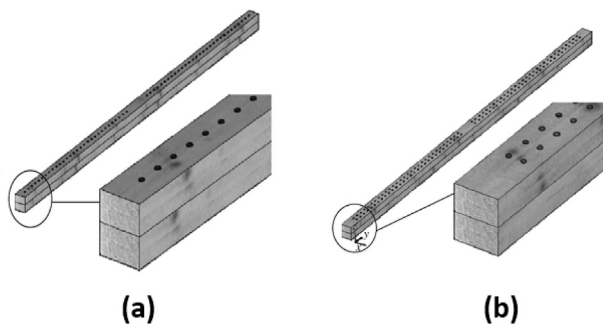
Schematic diagrams of laminated timber beam manufactured by Bocquet et al. (2007): (a) Single-row welded with dowels and (b) Double-row nailed.
